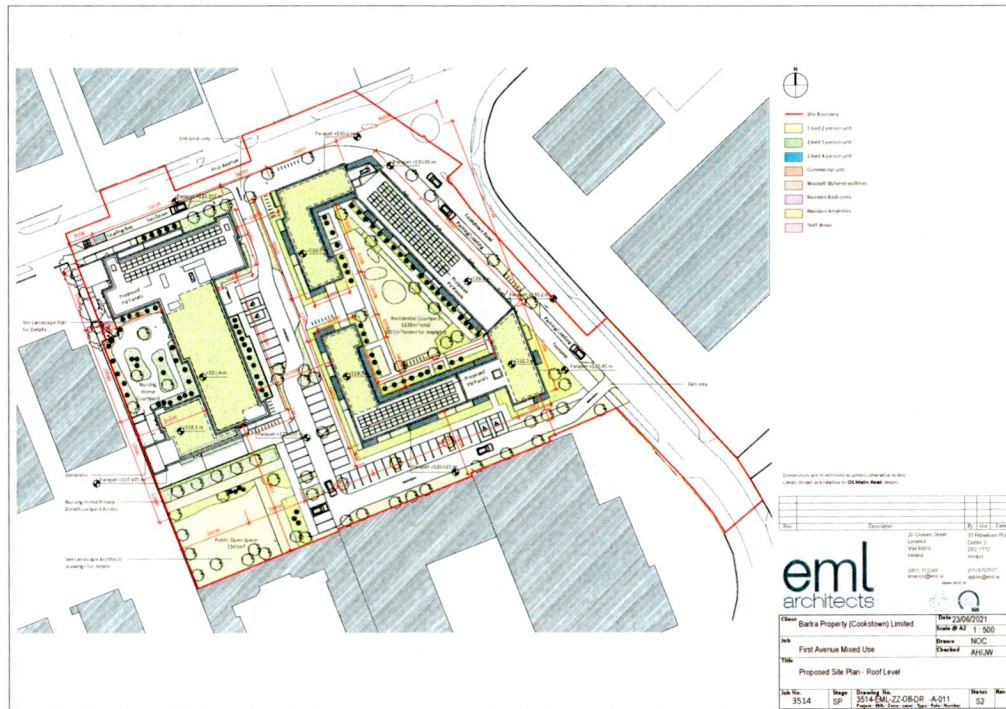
Site Layout Plan Submitted with SDCC Ref. SD21A/0196
